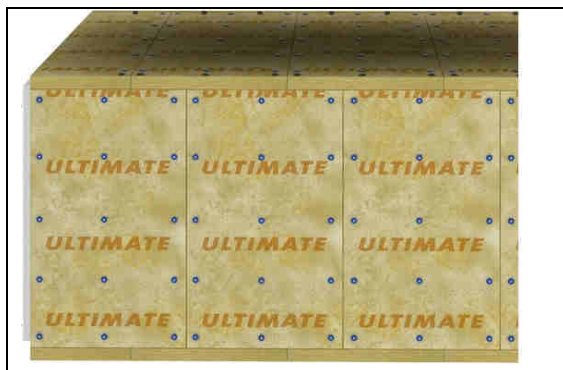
Ultimate Protect Slab 4.0 installation (duct down side).
